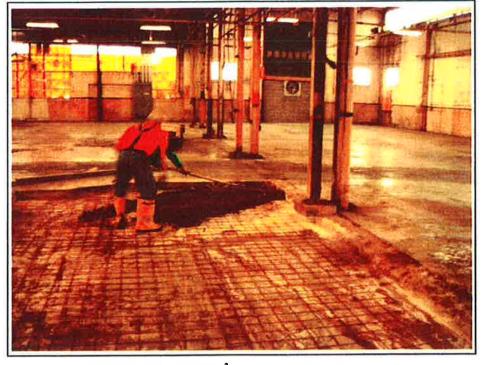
4,000 lb/in² compressive strength concrete.
